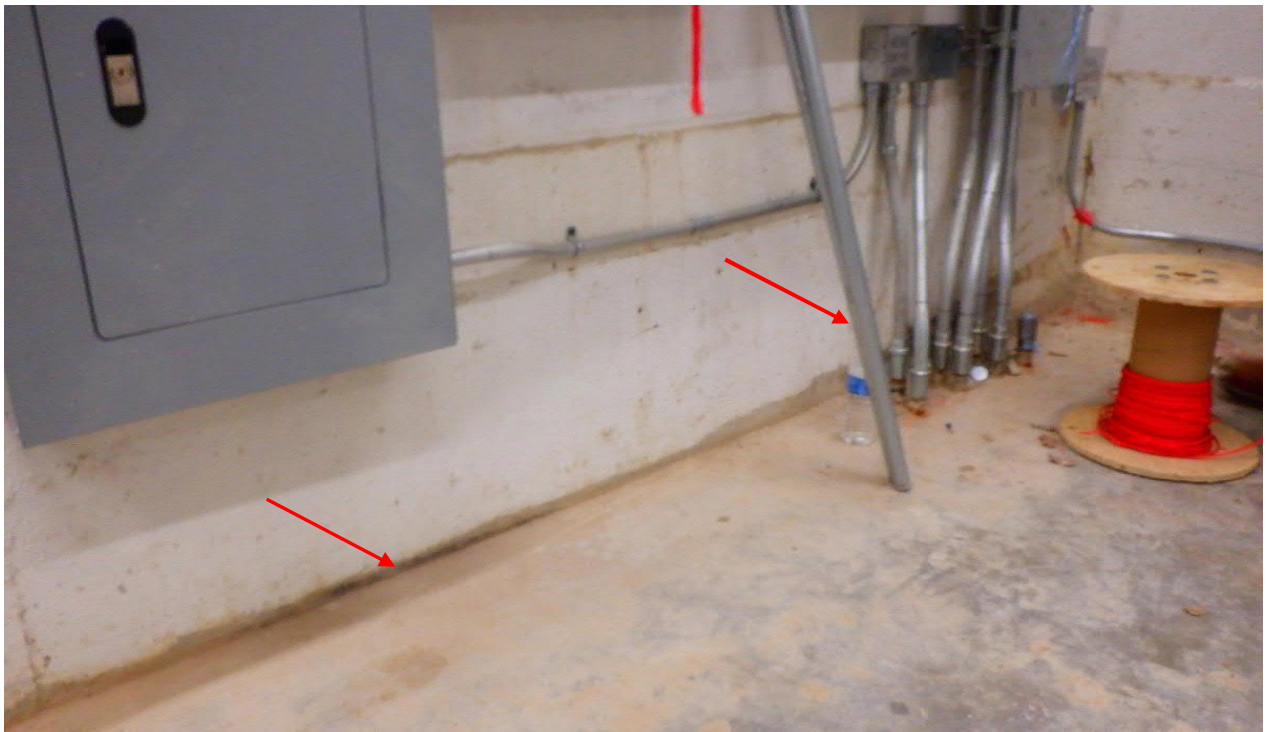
View of fungal growth locations observed on northwest lower CMU block/concrete wall in 1st Floor Electrical Room 1A-158.
